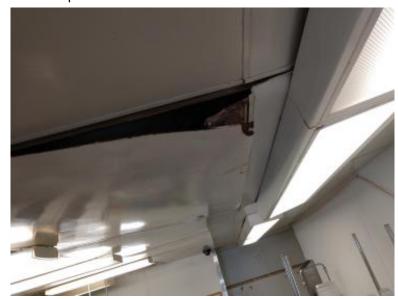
Caption: HM 12 - 4' Glued on Ceiling Tiles
